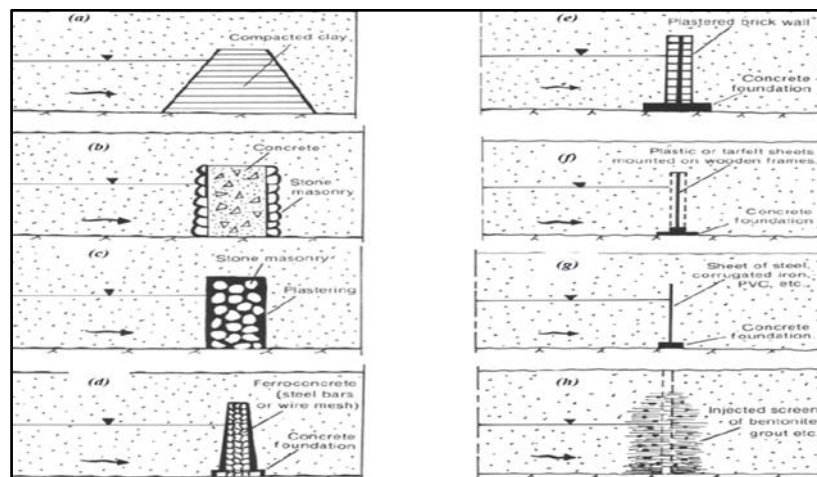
Subsurface dam types from Nilsson (1988) presents a) clay dam, b) concrete dam, c) stone masonry, d) reinforced concrete dam, e) plastered wall, f) plastic sheet, g) steel sheet, and h) injected screen (Nilsson, 1988).
